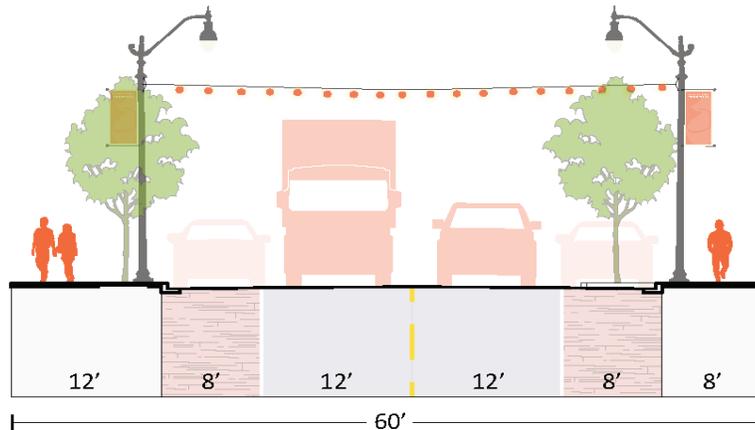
C (1). Van Emmon Street (Long-term).
